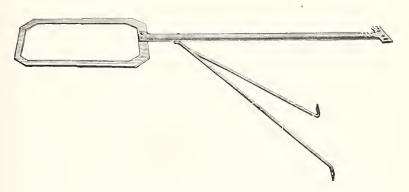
IRON FRAME, FOR WALL CORNERS.
